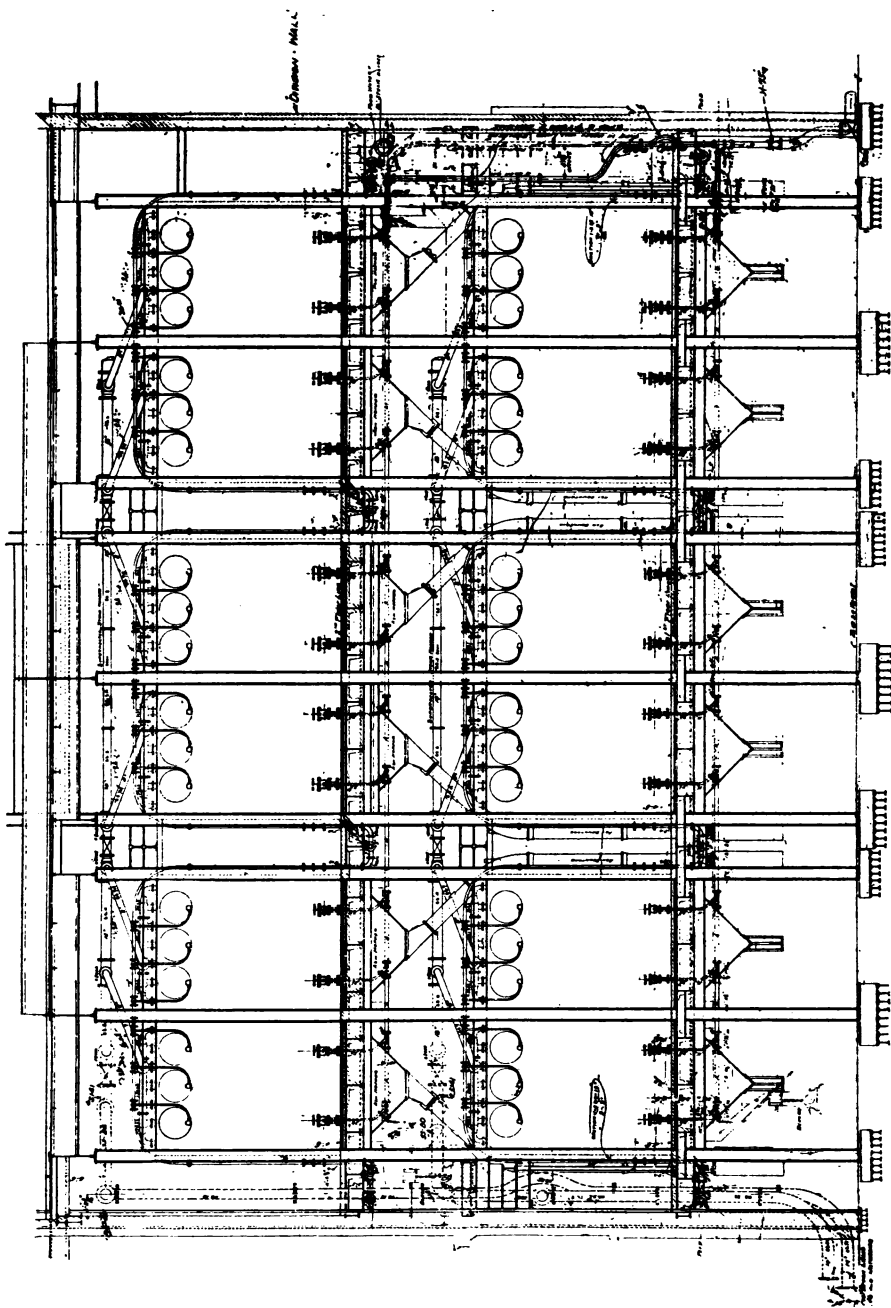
Section through Firing Aisle, Boiler House, Waterside No. 2.
